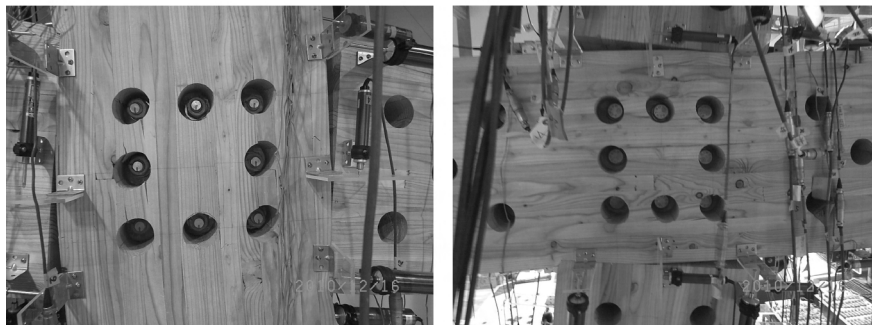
Shear cracks at pre-drilled hole periphery
